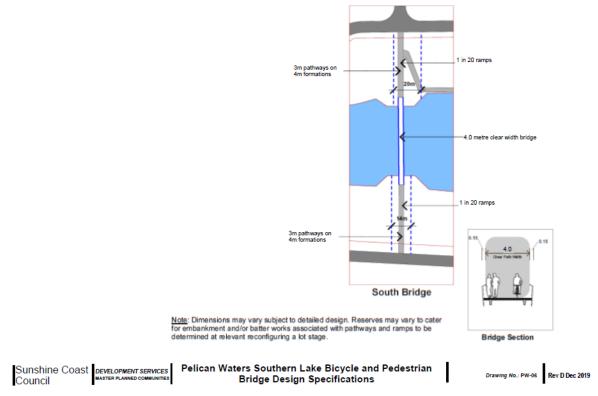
Proposed Drawing 6 - Bridge Design Specifications
